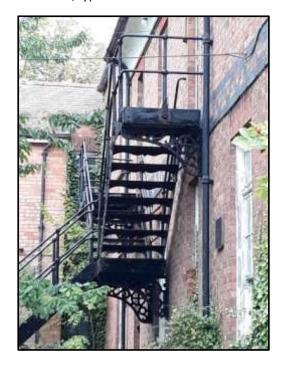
Block S, external metal stair to the south elevation of the southern range
